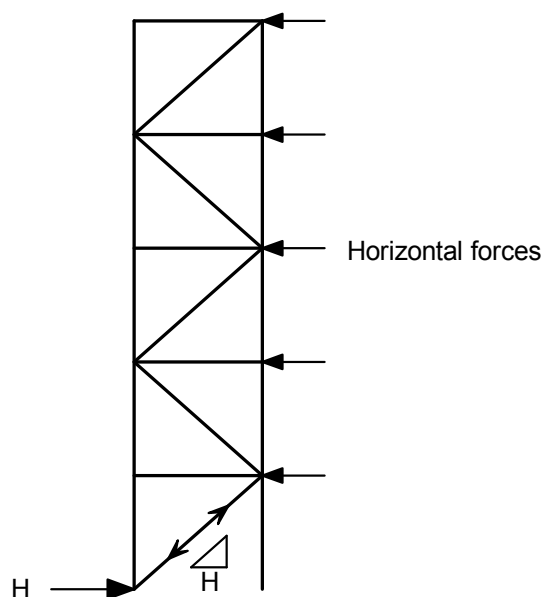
Nominal allocation of wind load to floors and roof
